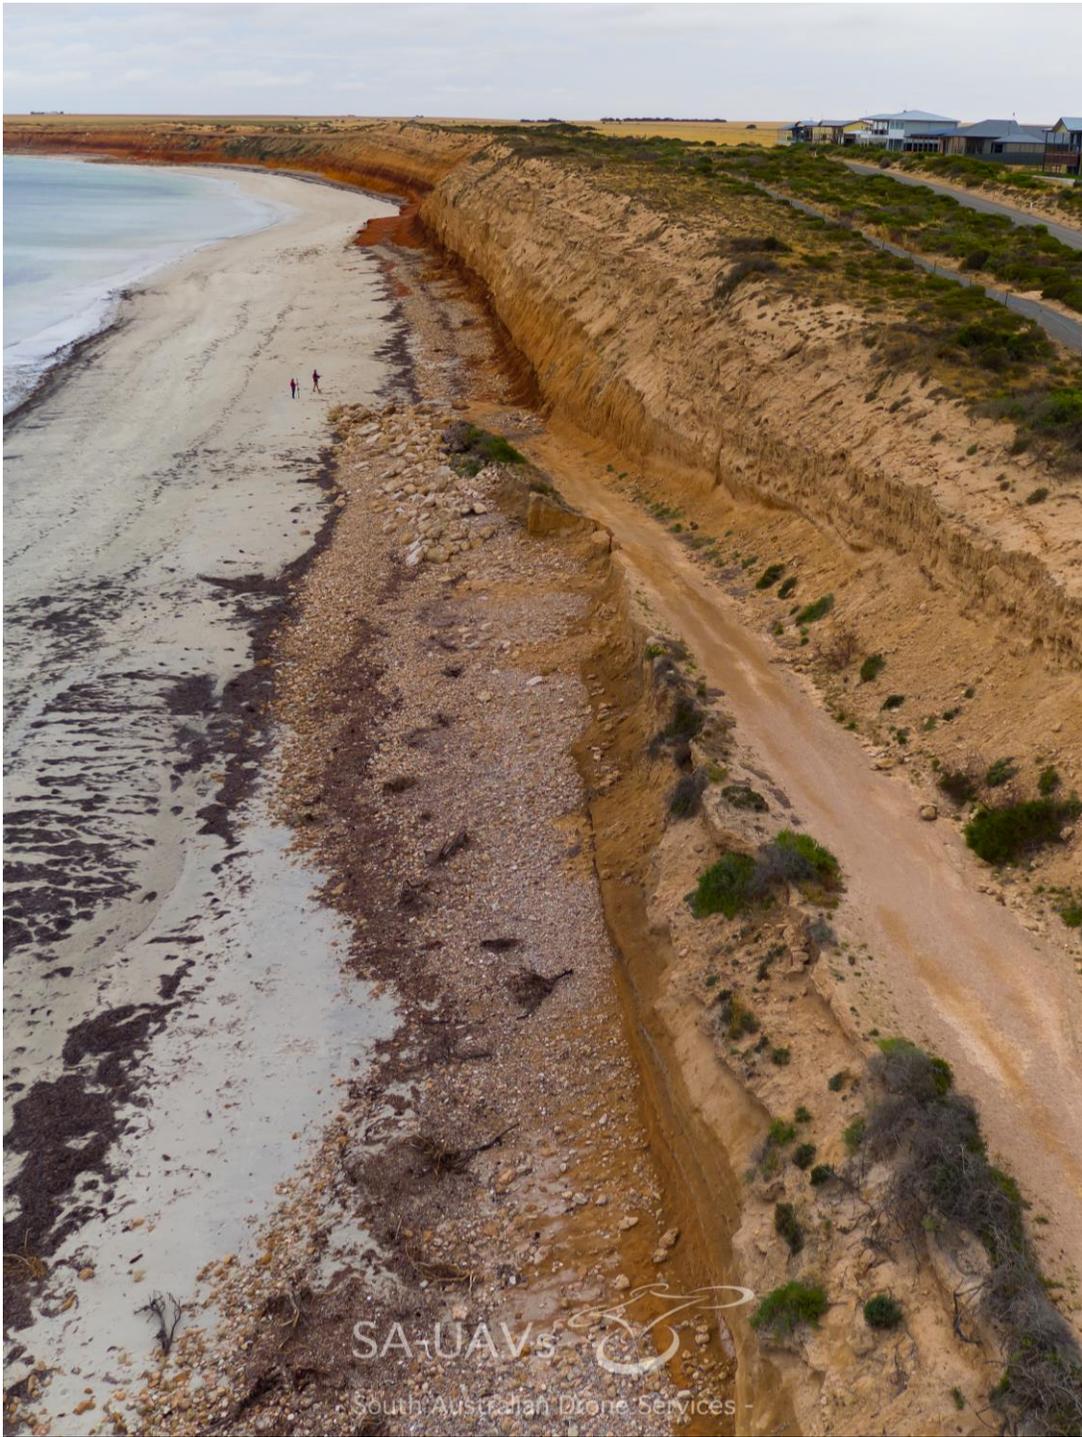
Existing cliff west of the road is unstable. It is collapsed and undercut in some sections.
